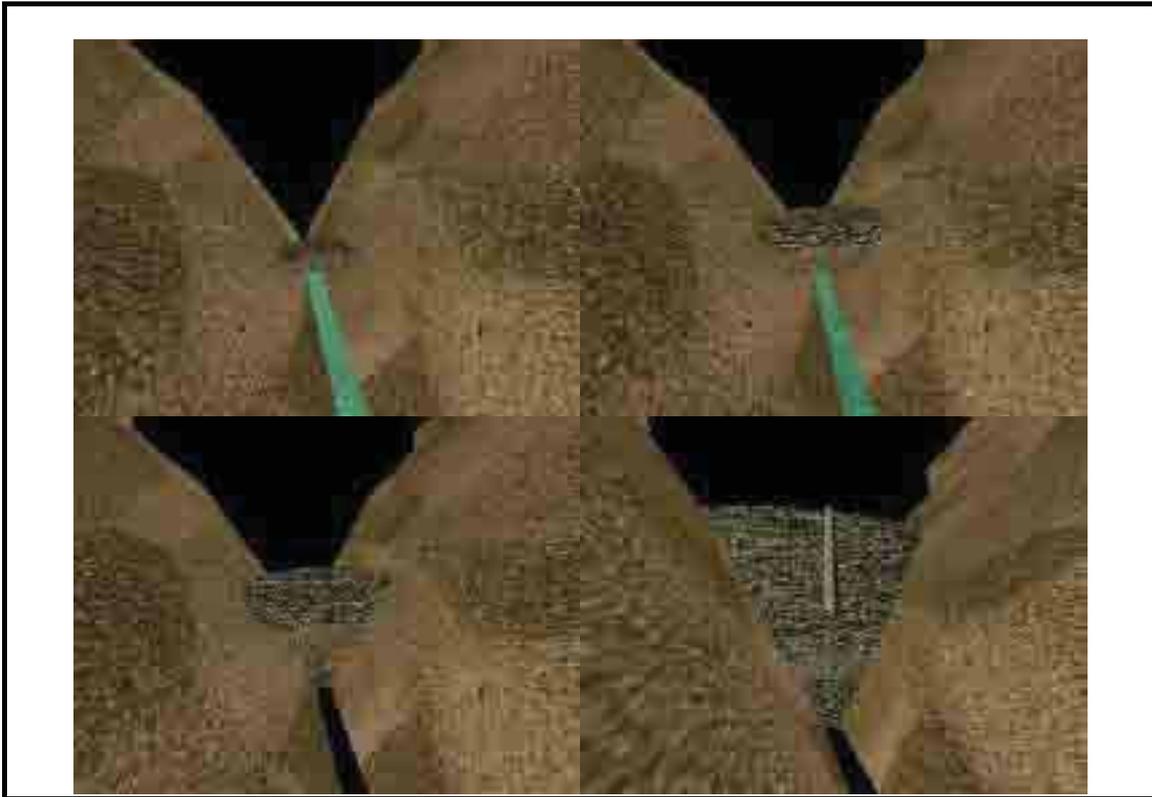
Construction of the dam on a brick arch to manage floods during construction
